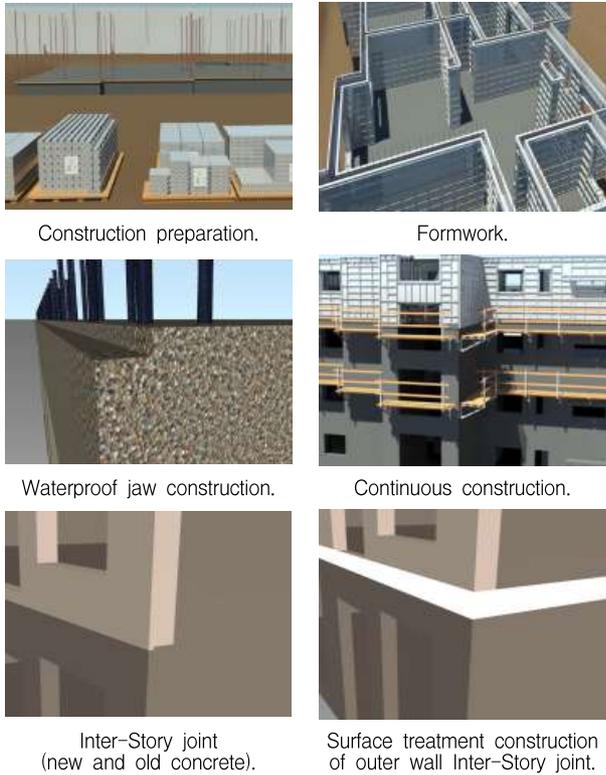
The construction process of waterproofing jaws the inter-story joint of apartment houses.
